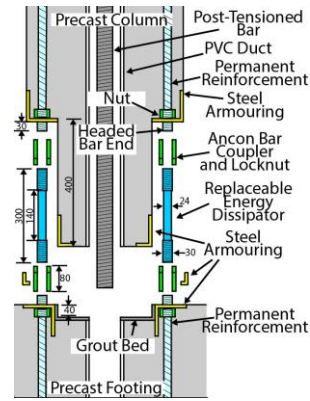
Controlled Damage Coupled Bar Connection (exploded view)
